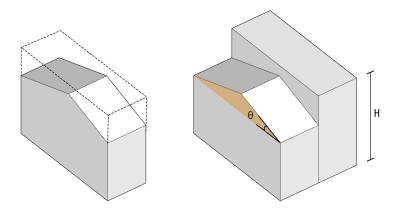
Schematic diagram of roof form and building height Source: Author's own drawing
